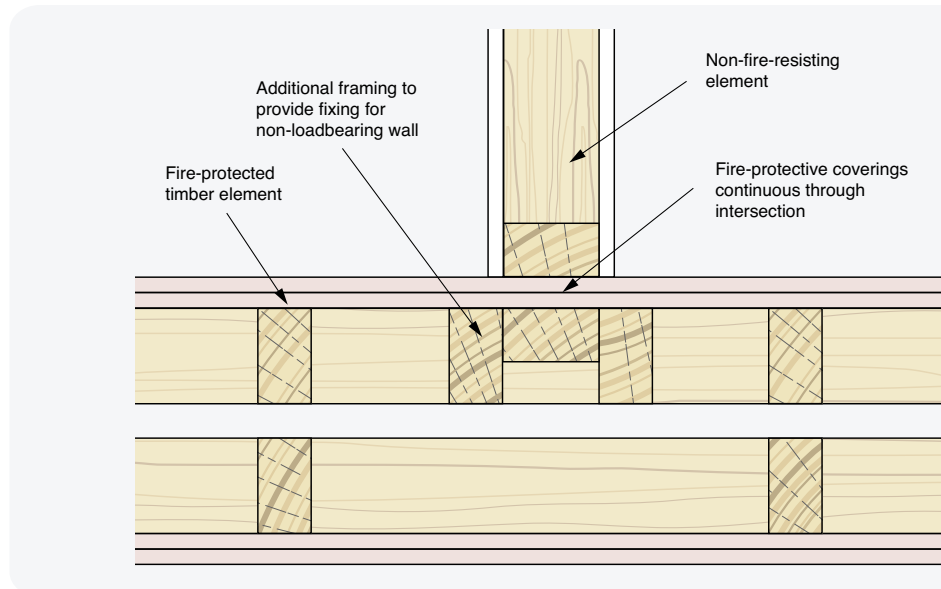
Junction of non-fire-resistant wall with fire-protected timber wall including additional framing detail.
